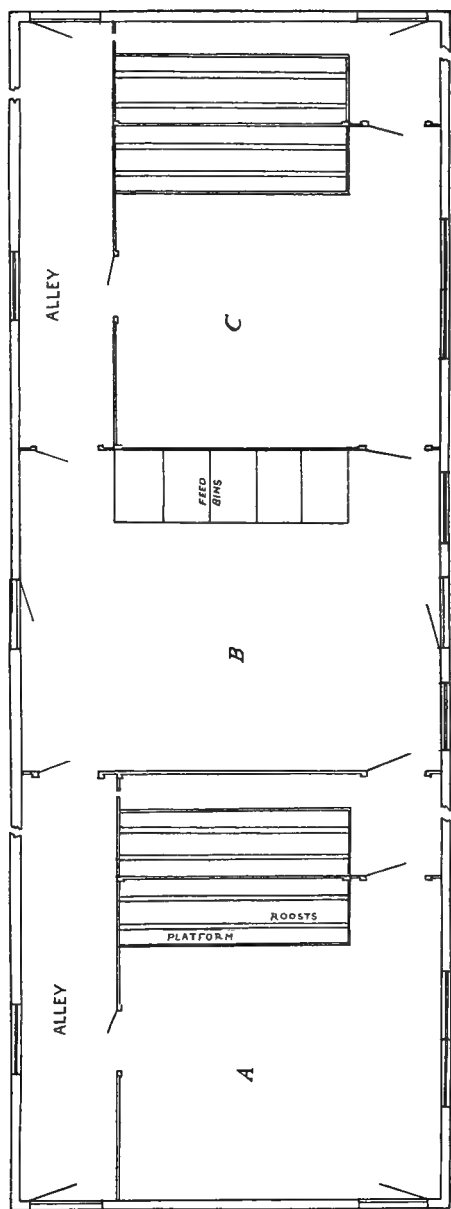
Ground plan of long poultry house, breaks in outside lines indicating omitted sections. *A*, west-end pen; *B*, central store and feed room; *C*, feed pen east of center
